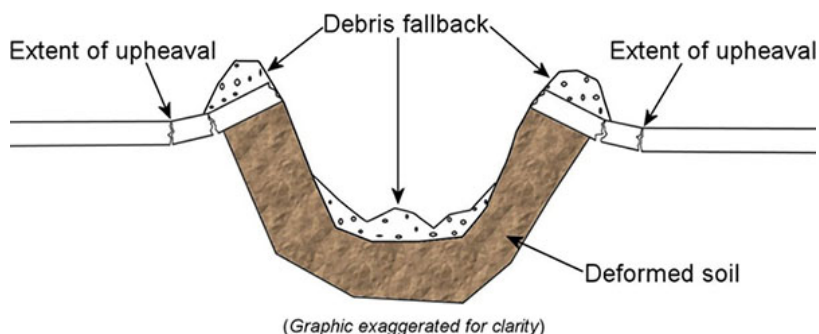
Cross section of crater illustrating upheaved pavement.
